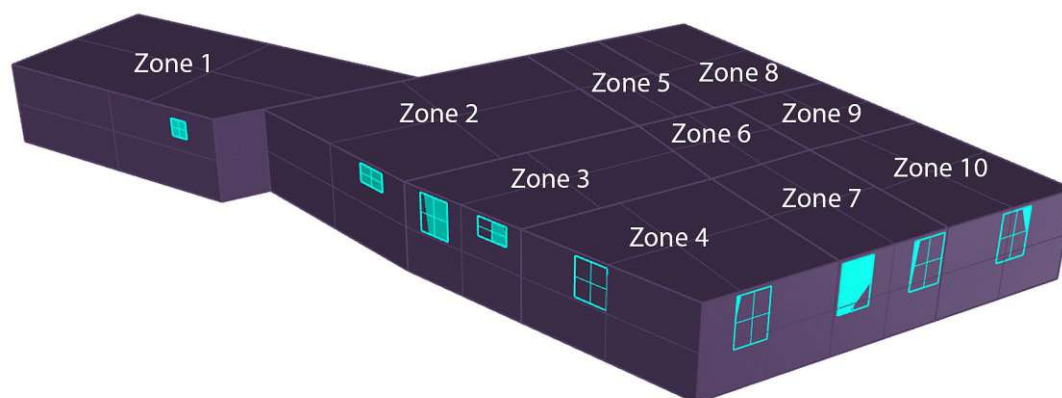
Zones of House of Georgi Mavridi (Lamartine) – ground floor
